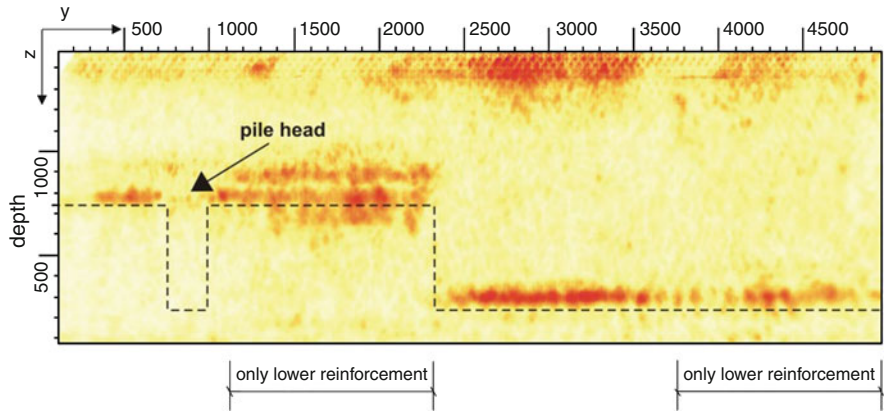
Cross section: c-c Ø28, s=10 cm (only lower reinforcement)
